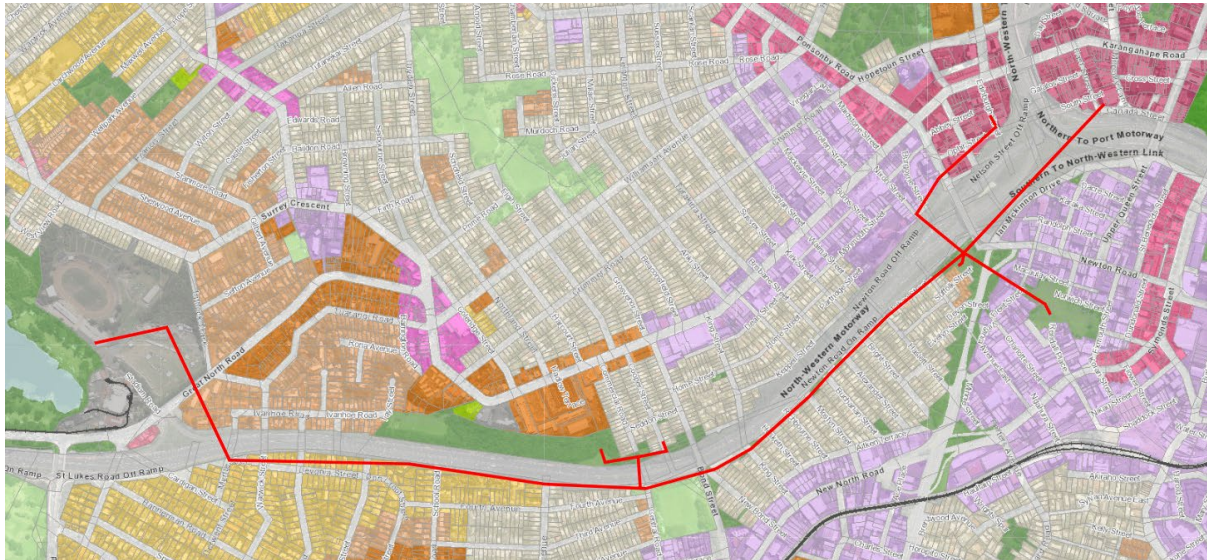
Underlying Auckland Unitary Plan zones, Motions Collector Sewer location Overall Plan (Pipe Jacking Option)
